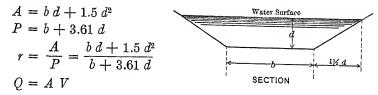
(Part 3 of 3).—Hydraulic Elements of Trapezoidal Sections.
